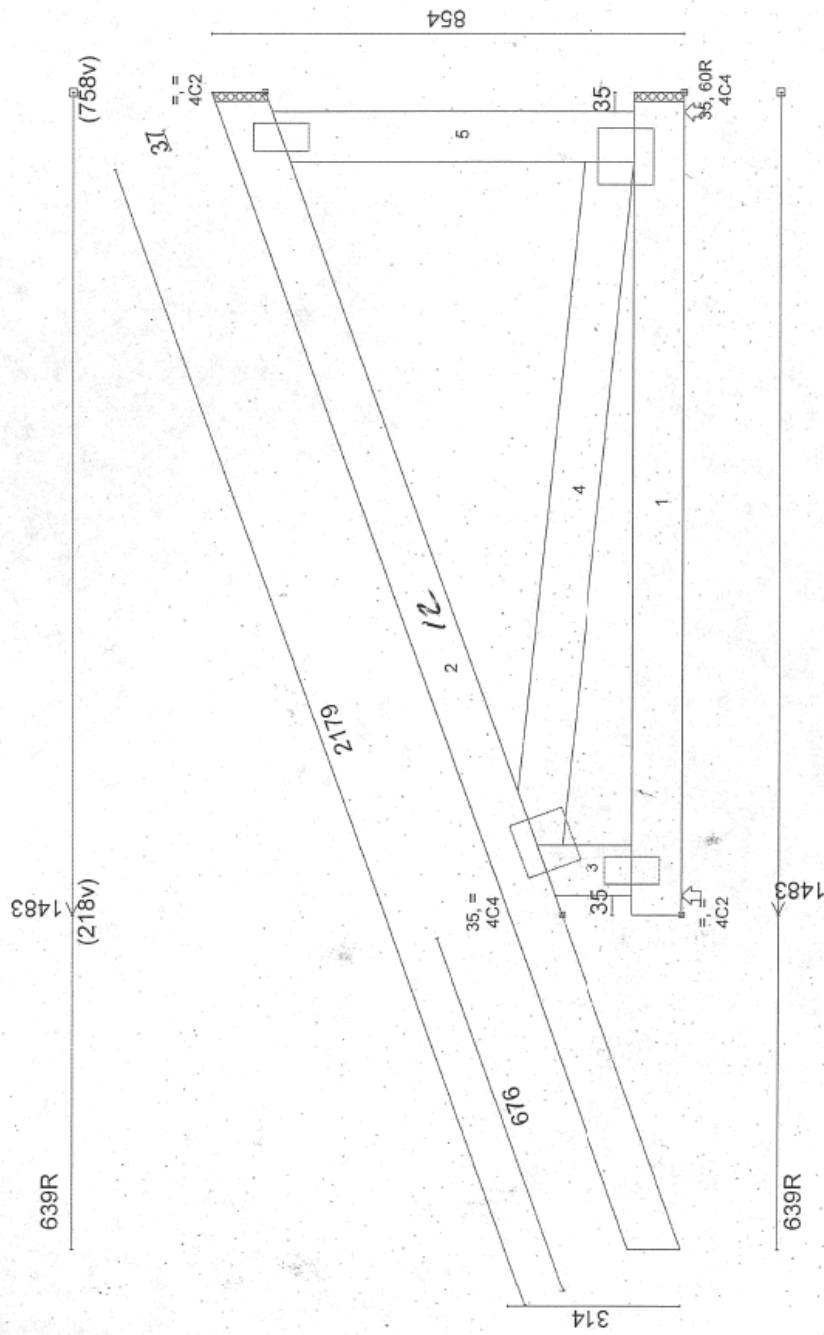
Test Cell 2 – Roof-framing Data: Truss C1 (not to scale)
